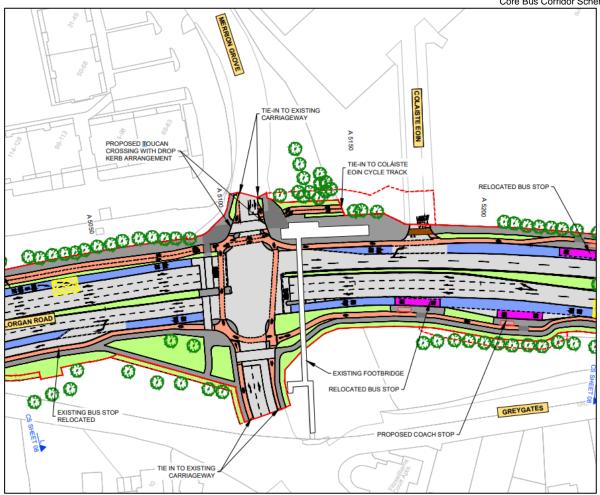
Extract from General Arrangement Drawings at Coláiste Eoin (Sheet 16)
